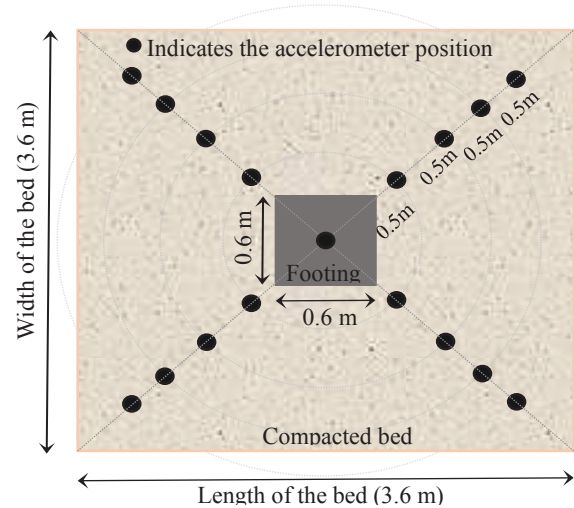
Layout of an arrangement of accelerometers over the foundation bed (not to scale)
